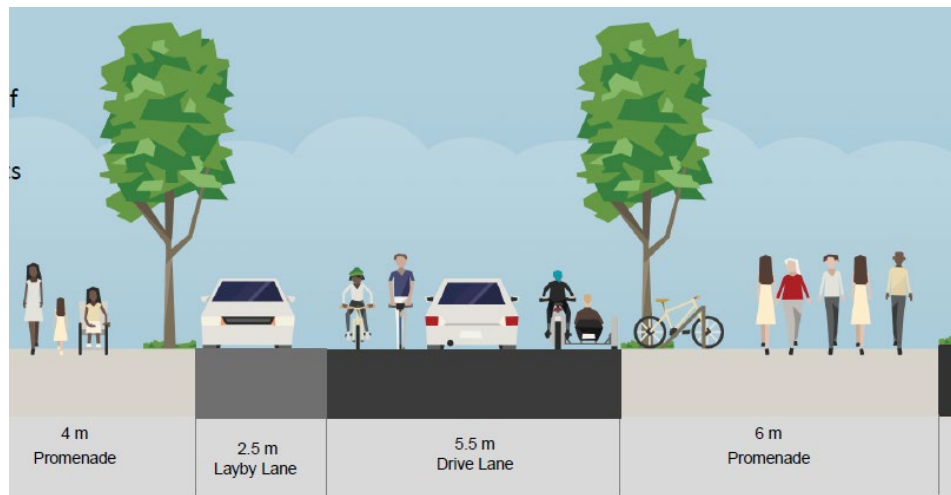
STREET DESIGN CONCEPT #1 - SHARED STREET
